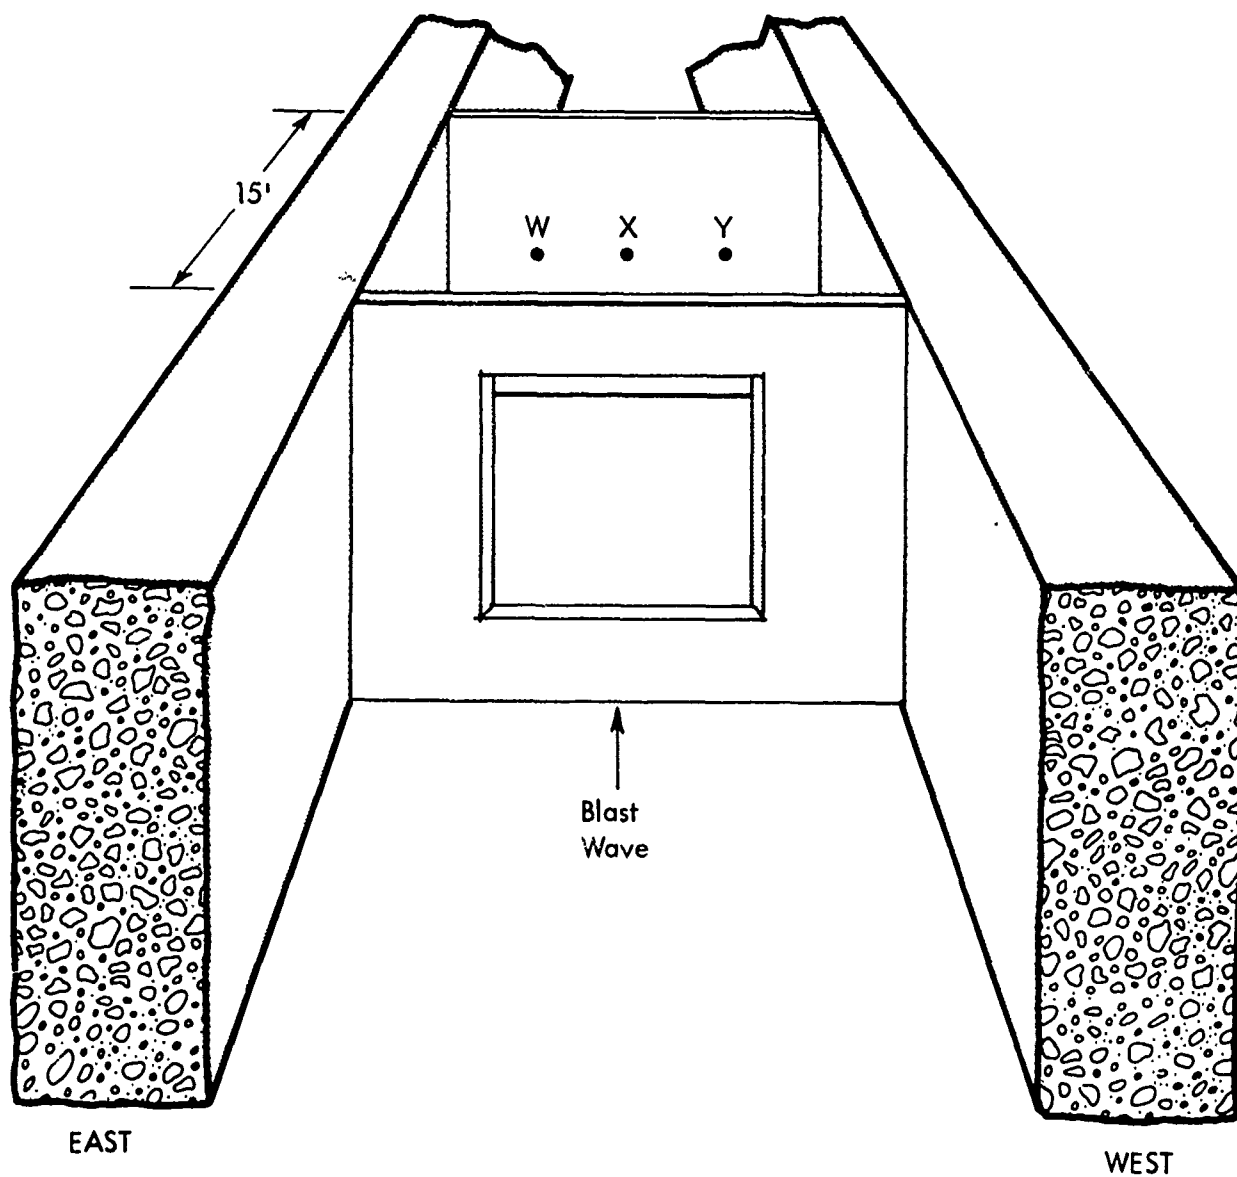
Test Setup for Window Wall Loading Test Series
